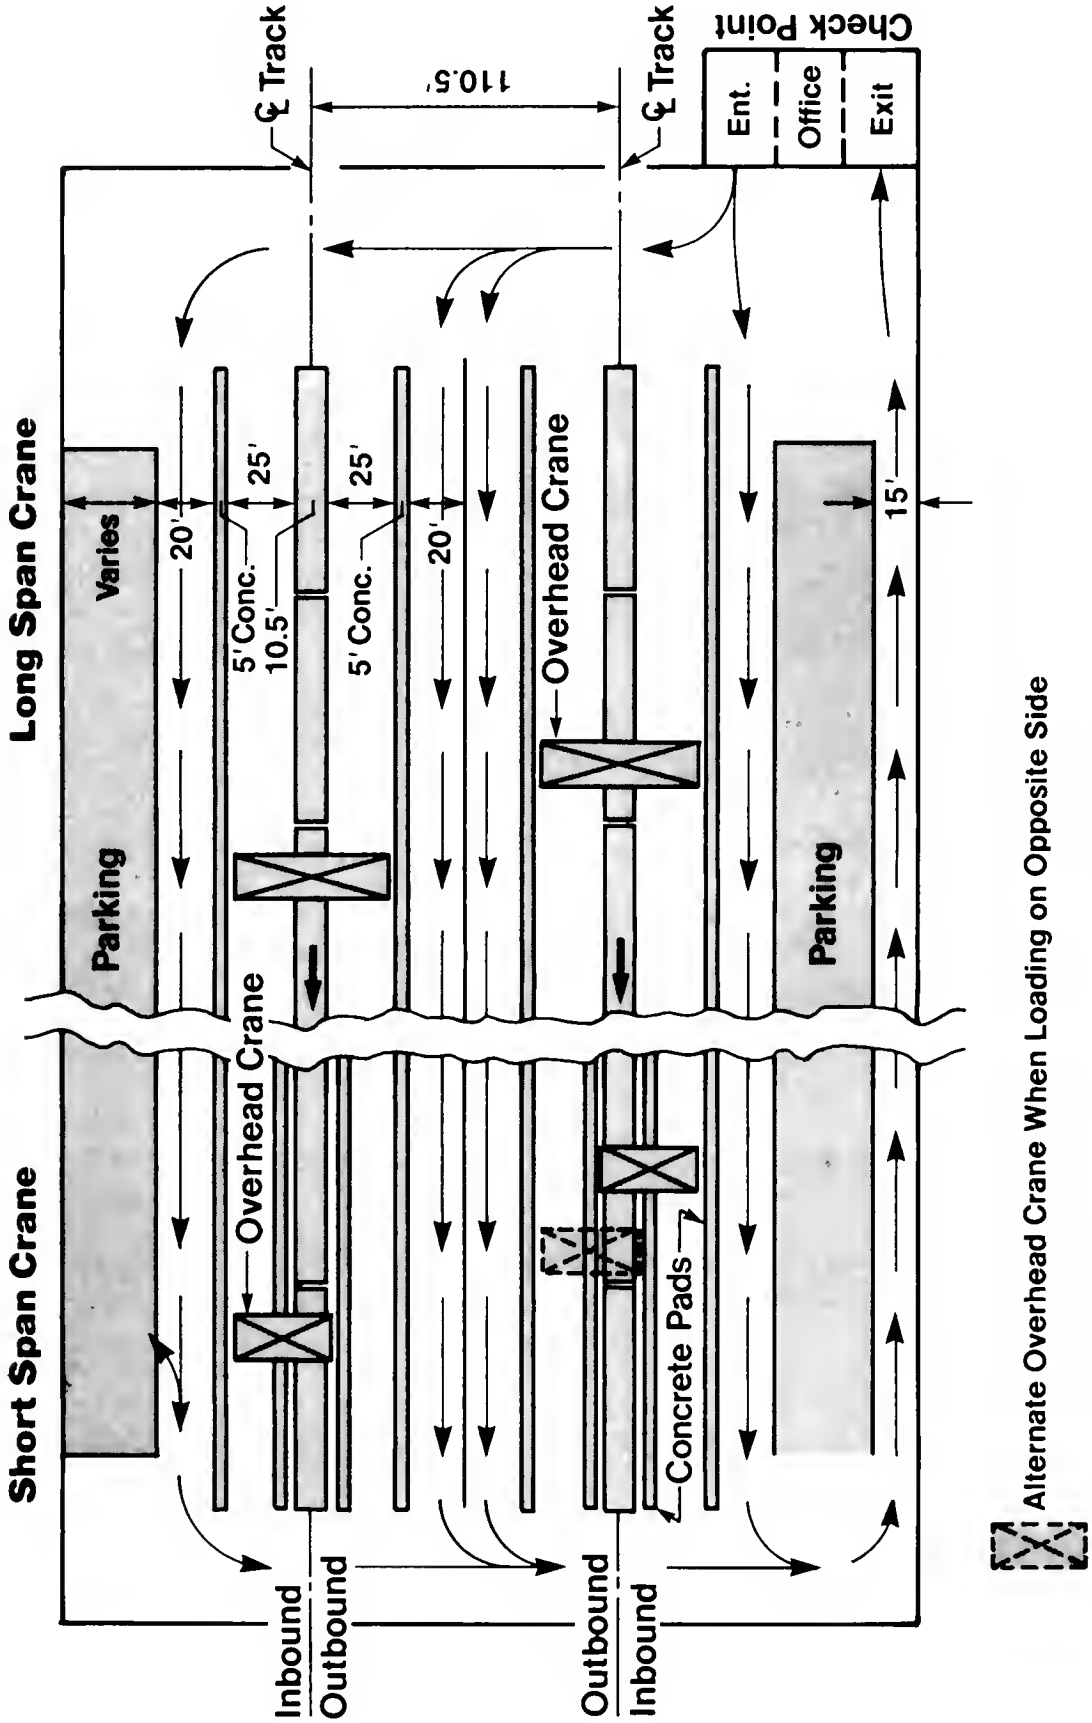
High-Volume Terminal, Crane Loading with Outside Parking
